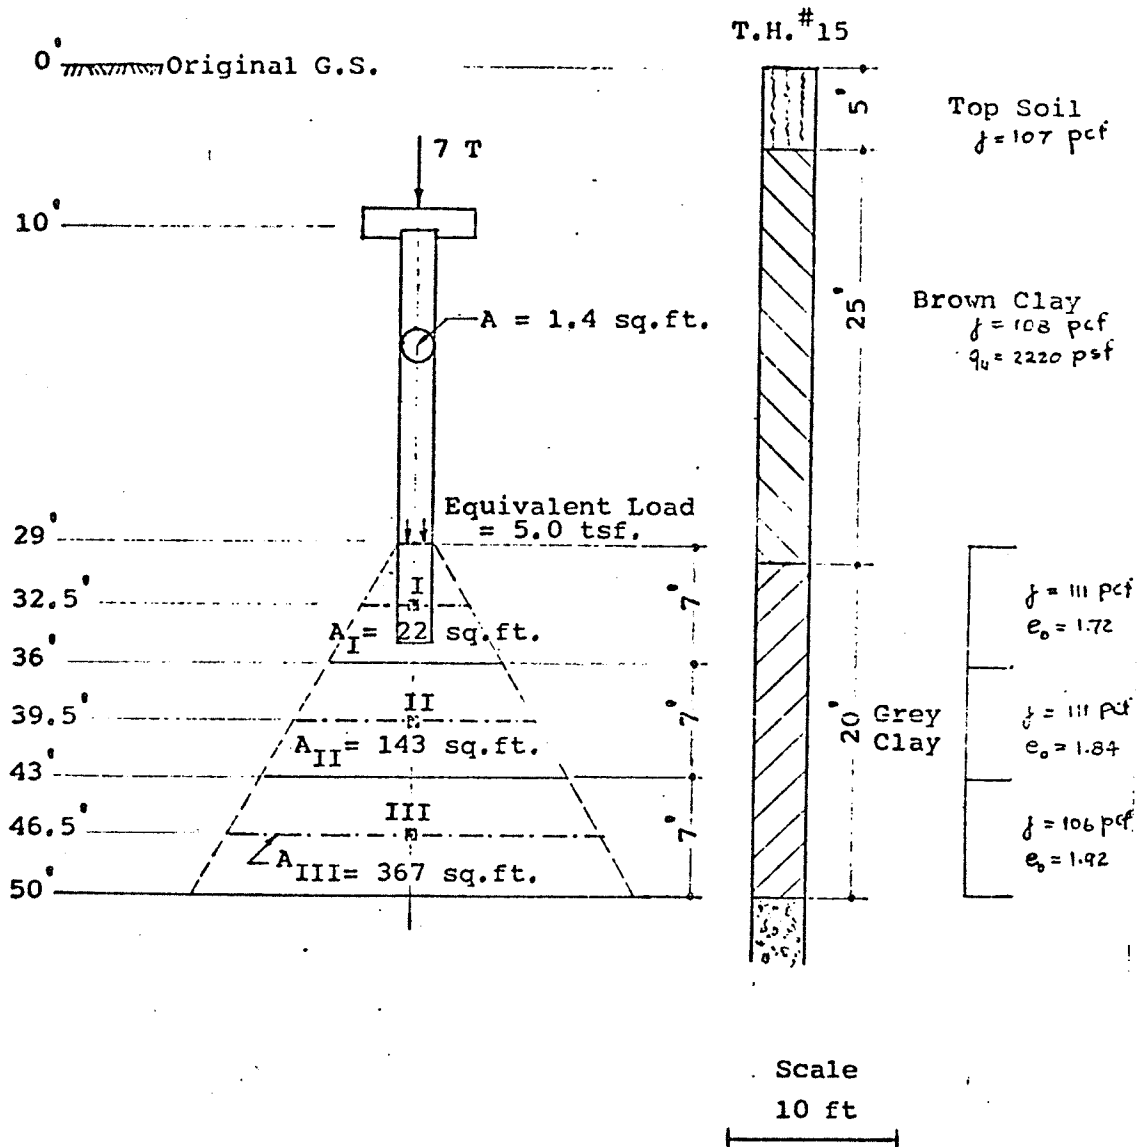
Soil Sub-division Under Pile Foundation 2
